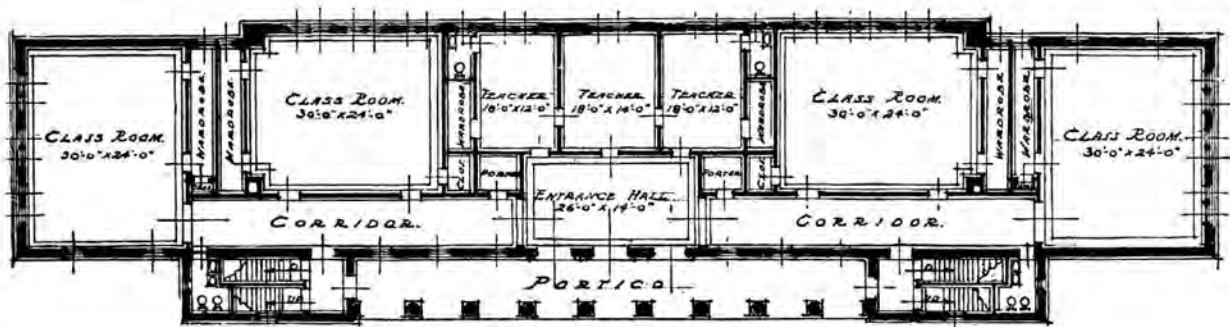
FIRST FLOOR PLAN, THE ABERDEEN PUBLIC SCHOOL, ABERDEEN, NORTH CAROLINA
